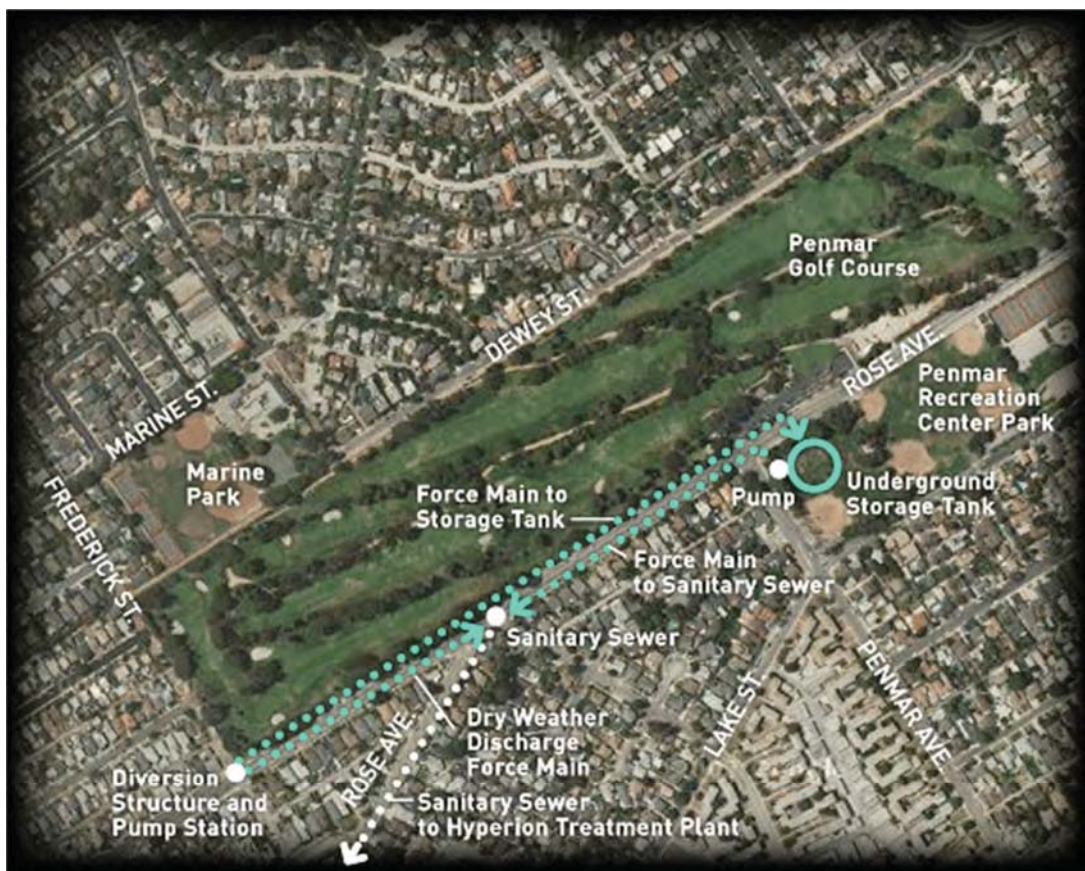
Penmar Water Quality Improvement Project Conceptual Site Plan
